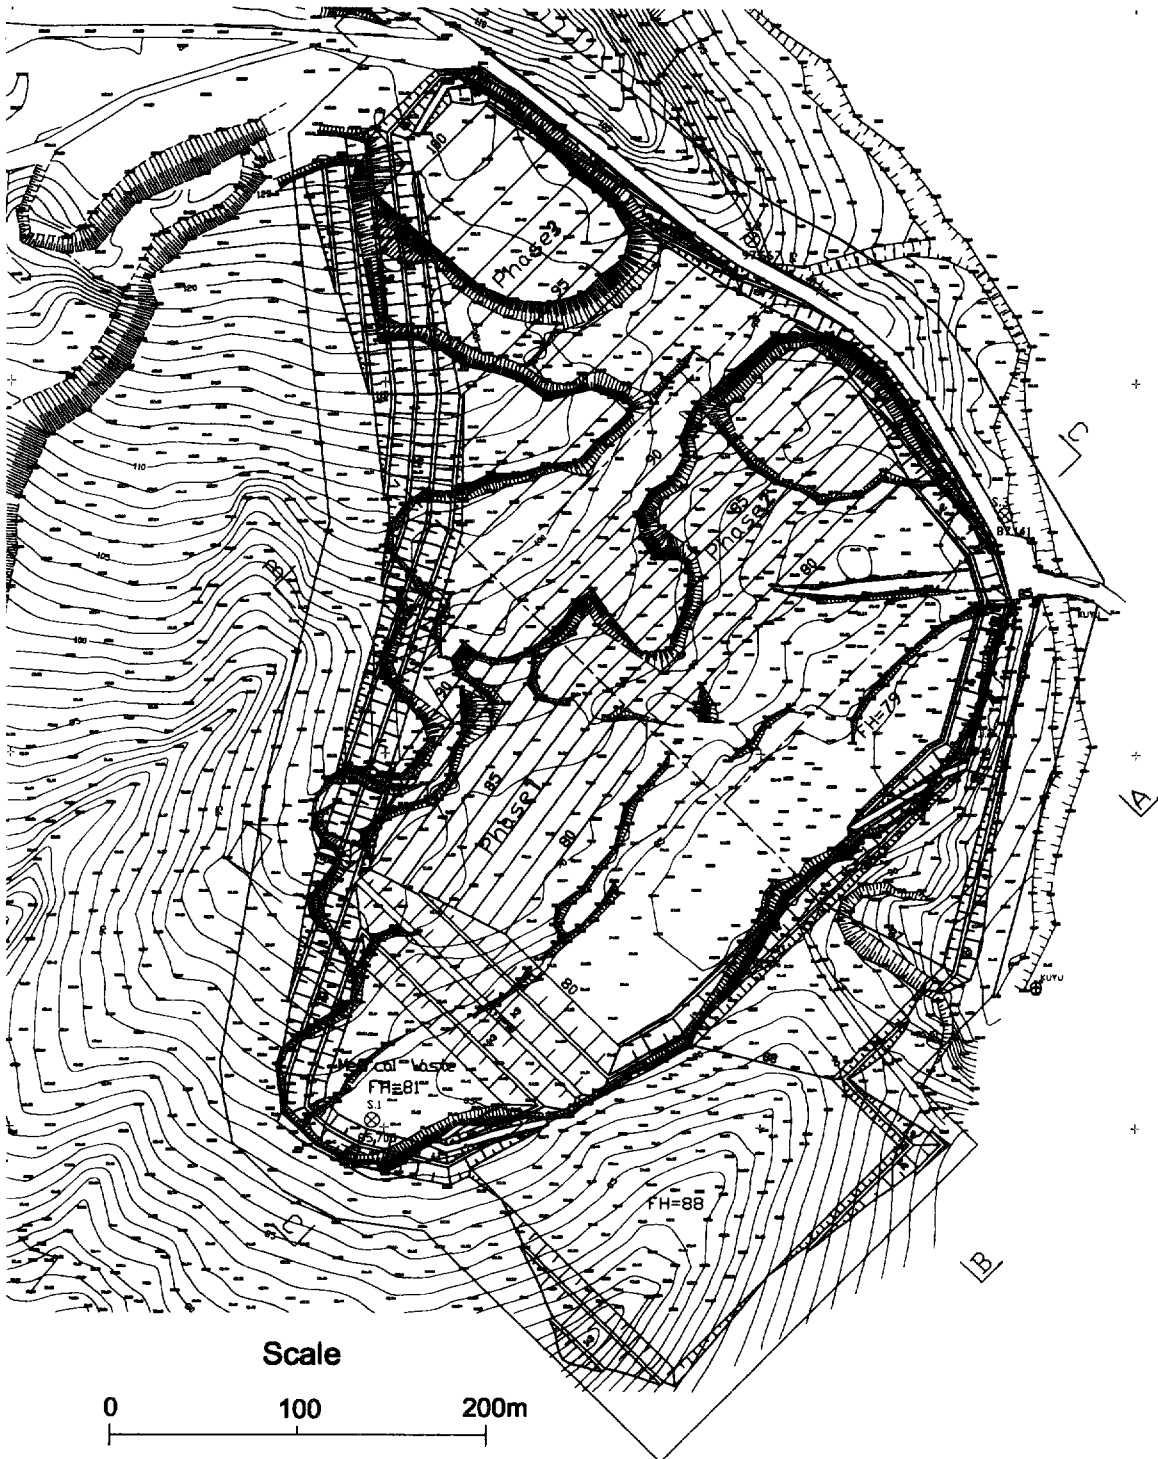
The Condition of Proposed Landfill Site at Development Stage in Cimsa
